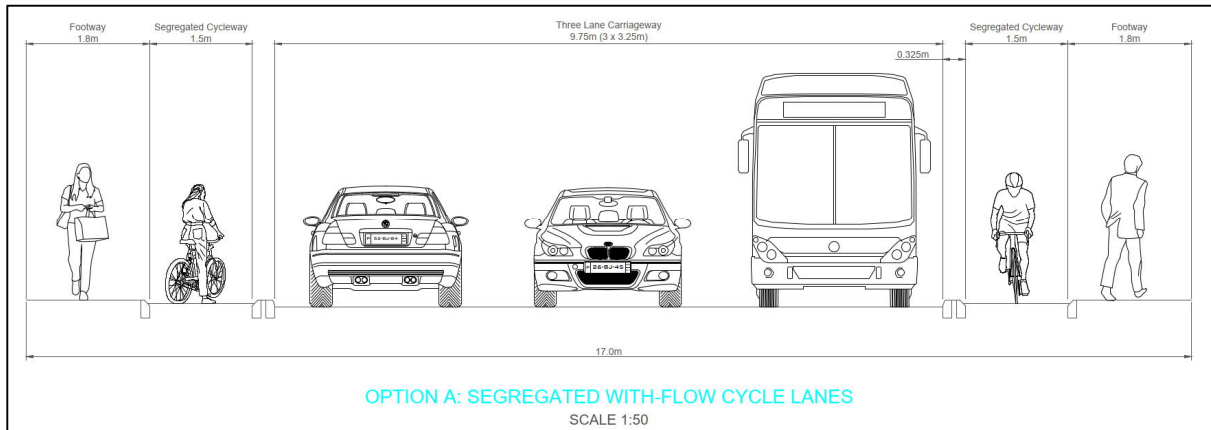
King Street - With-Flow Cycleway Cross Section
